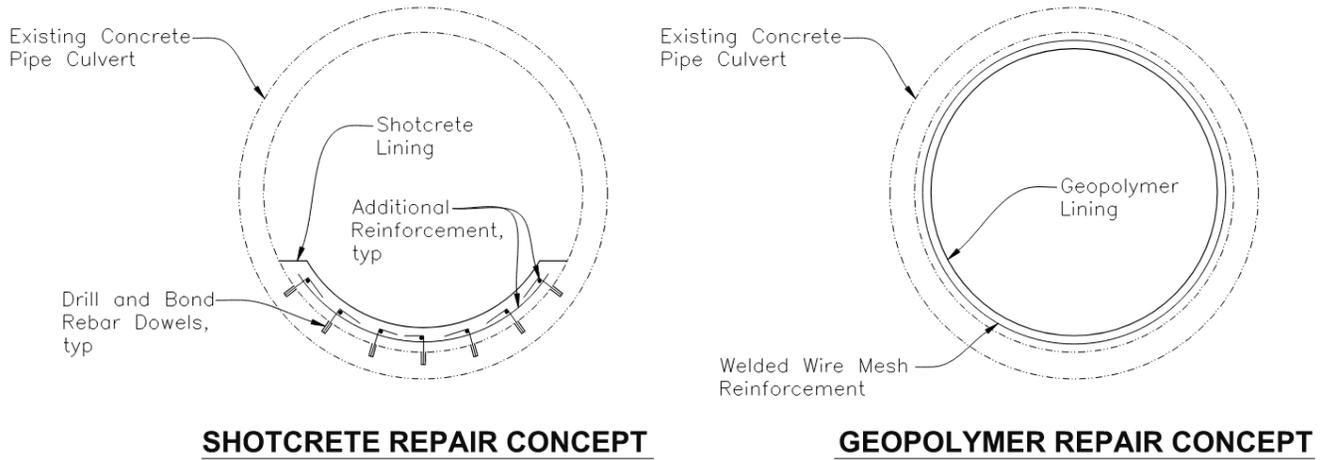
Preliminary Repair Concepts for the Pipe Culvert Sections
